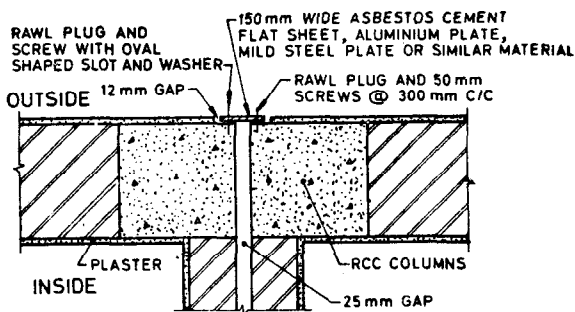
TYPICAL DETAILS OF EXPANSION JOINT AT DIFFERENT FLOOR LEVELS
